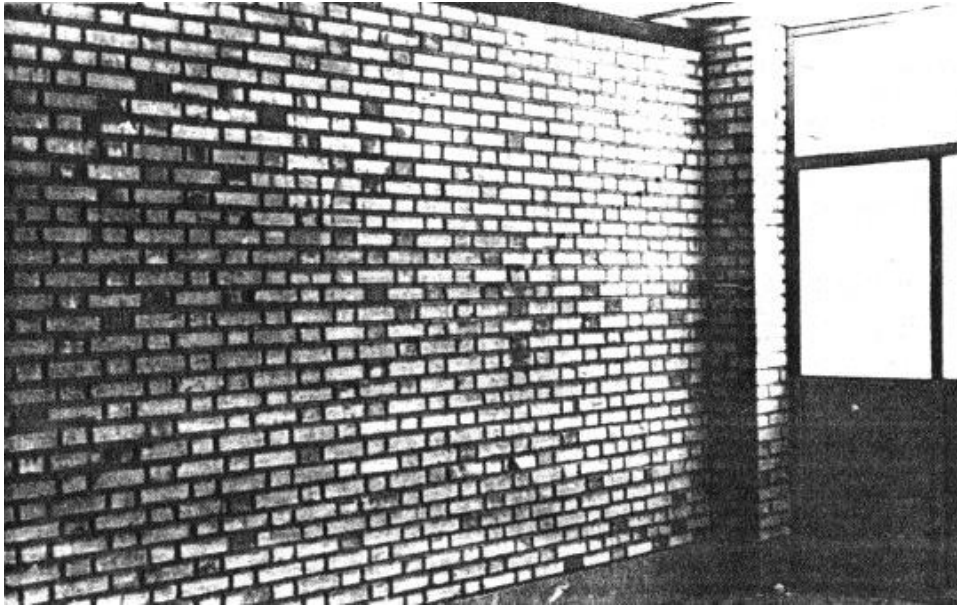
Failure cracks in the masonry wall of a building using arched roof supports with steel beams. Cracks result from in-place shear.
